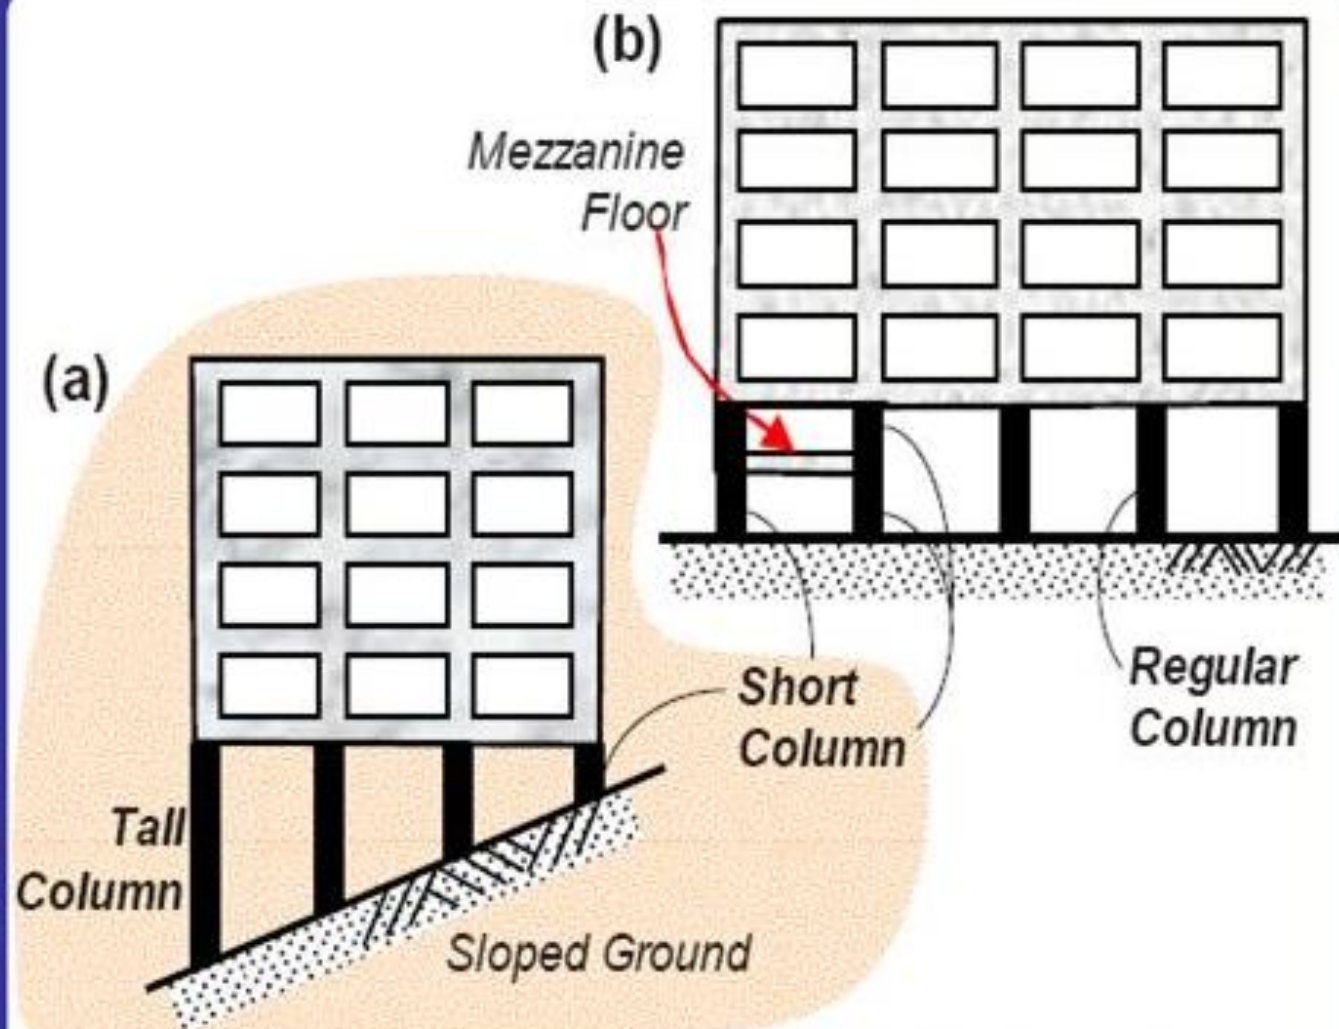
Buildings with short columns – two explicit examples of common occurrences.
